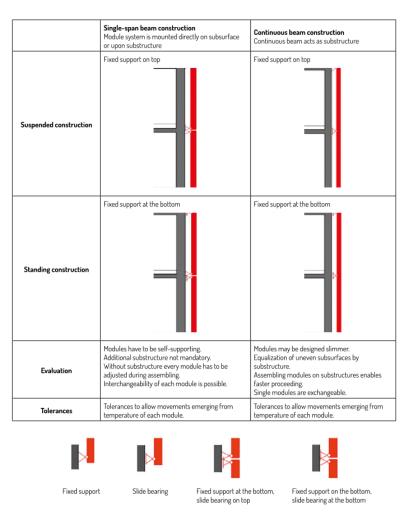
Single-span beam construction VS Continuous beam construction. Credits: Types of Buildings with Prefabricated Elements for (n)ZEB Performance.
